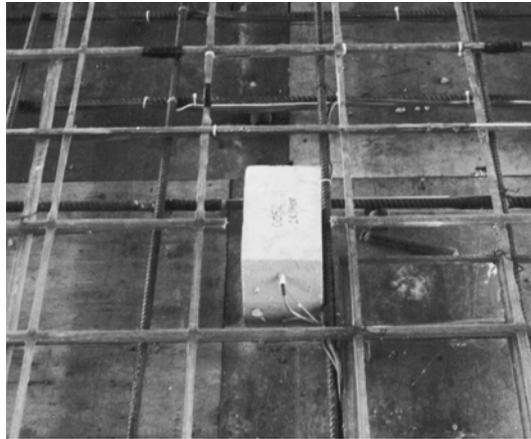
View of part of the deck with glass fibre reinforced polymer (GFRP) in the upper reinforcement mat, prior to pouring of the concrete. The steel reinforcement of the lower mat is also visible. A concrete block containing an embedded concrete gauge is in the centre of the picture, while in the upper half, gauges on the GFRP are wrapped in tape. Wires from other gauges are tied to the reinforcing bars
